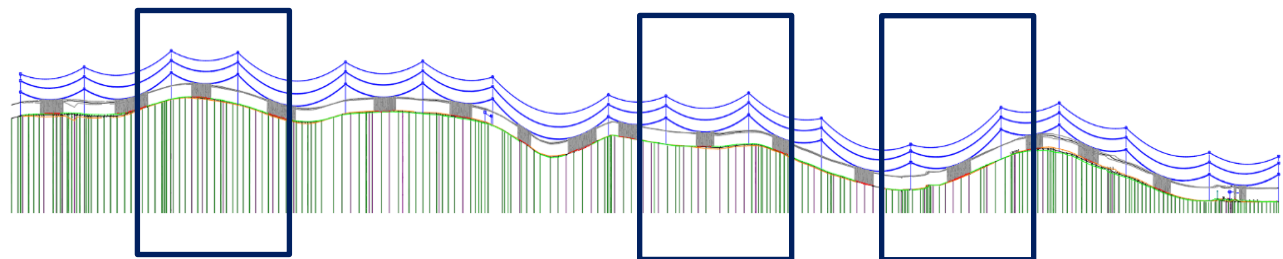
OHL and terrain profile for all variants with marked places of towers missing and reconfiguration
